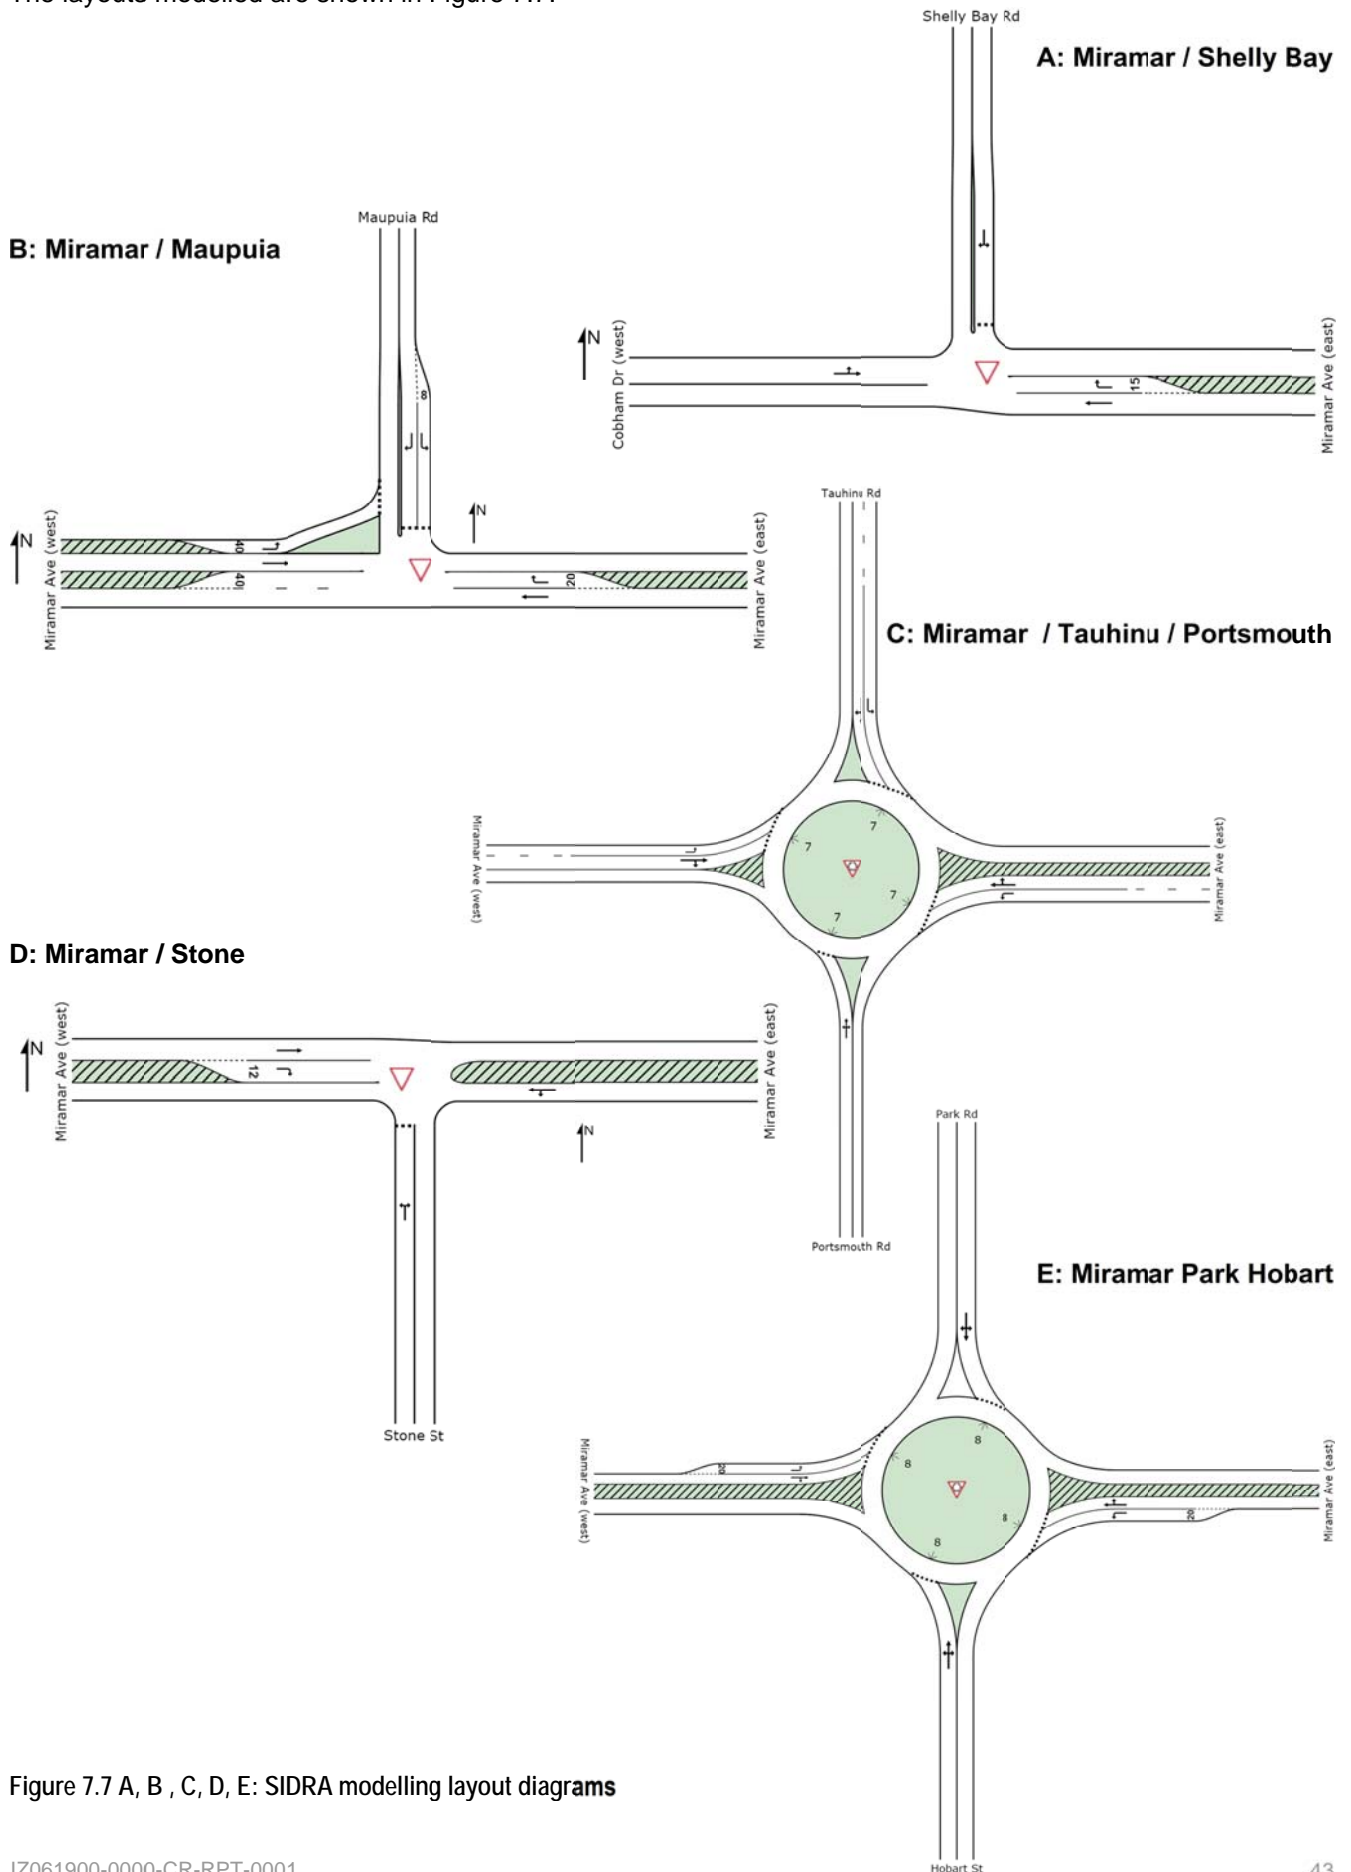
A, B, C, D, E: SIDRA modelling layout diagrams
